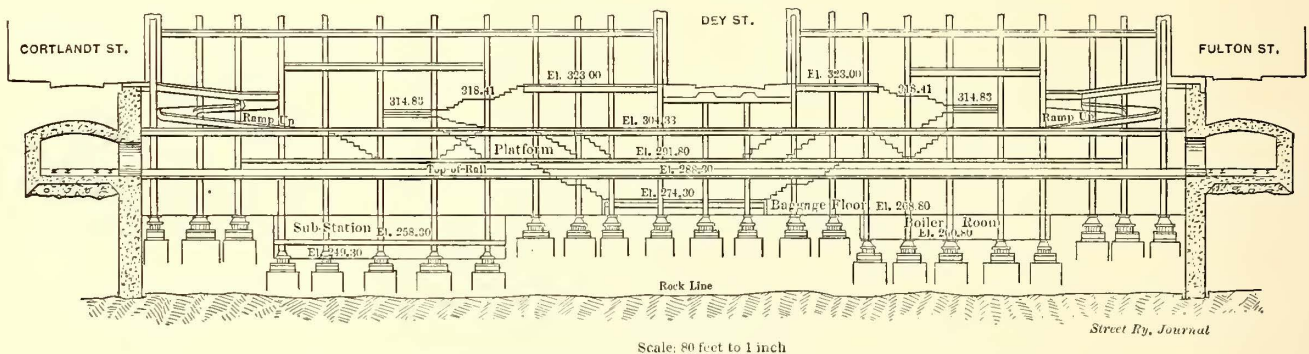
LONGITUDINAL SECTION OF CORTLANDT STREET STATION
